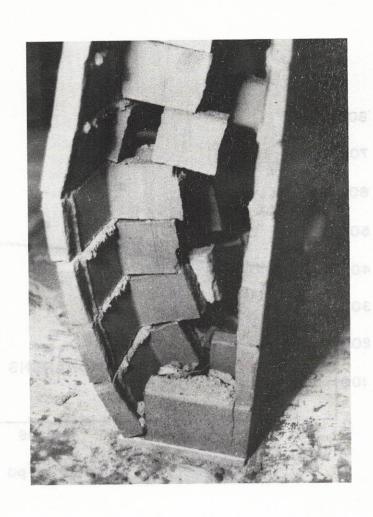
TYPICAL FAILURE OF MONARCH SPECIMEN
